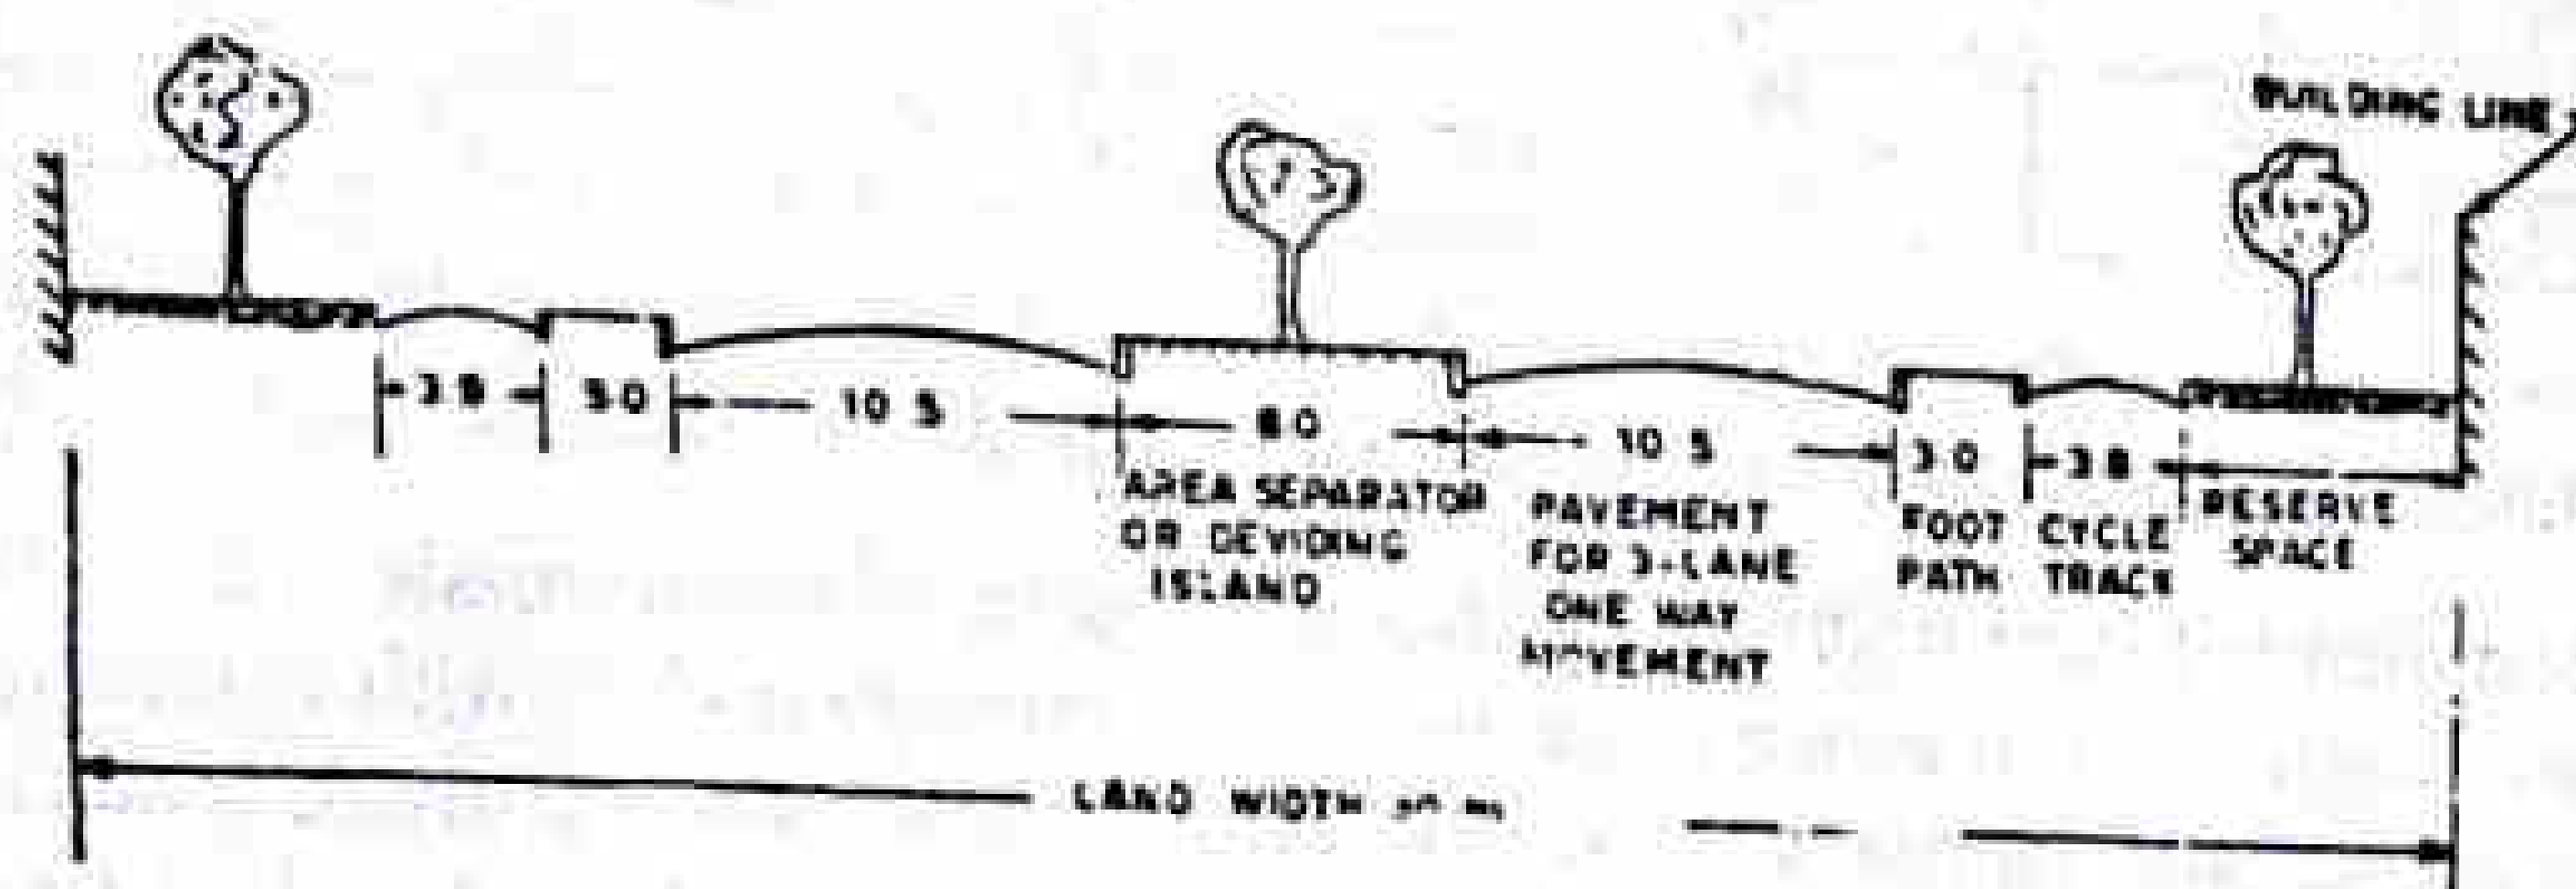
Cross Section of Divided Highway in Urban Area
